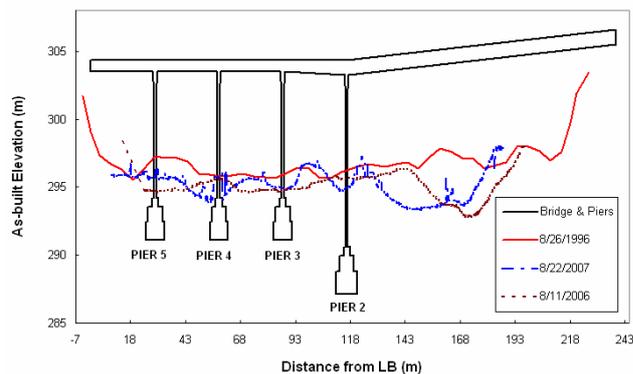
Surveyed upstream cross section and pier soundings at bridge 524, Tanana River at Big Delta, Alaska.
